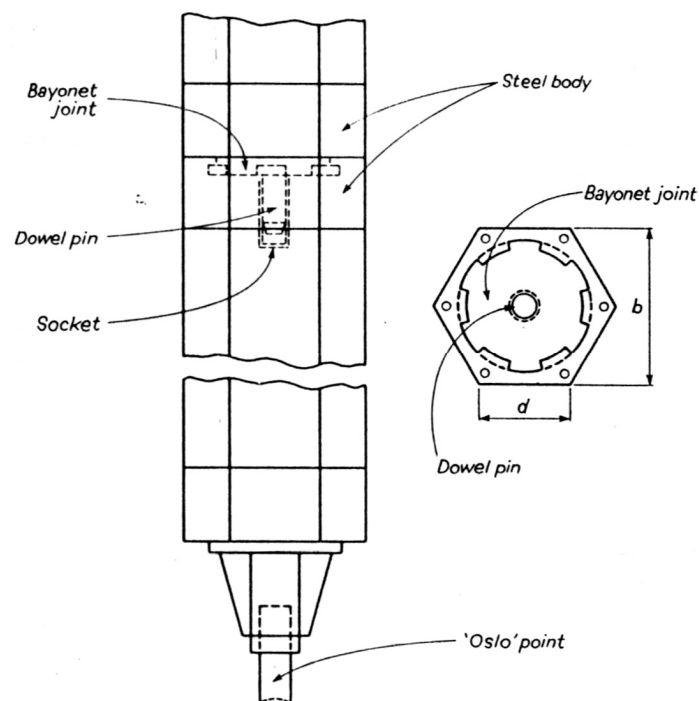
“Hercules” jointed precast concrete pile (Tomlinson, 1994)
